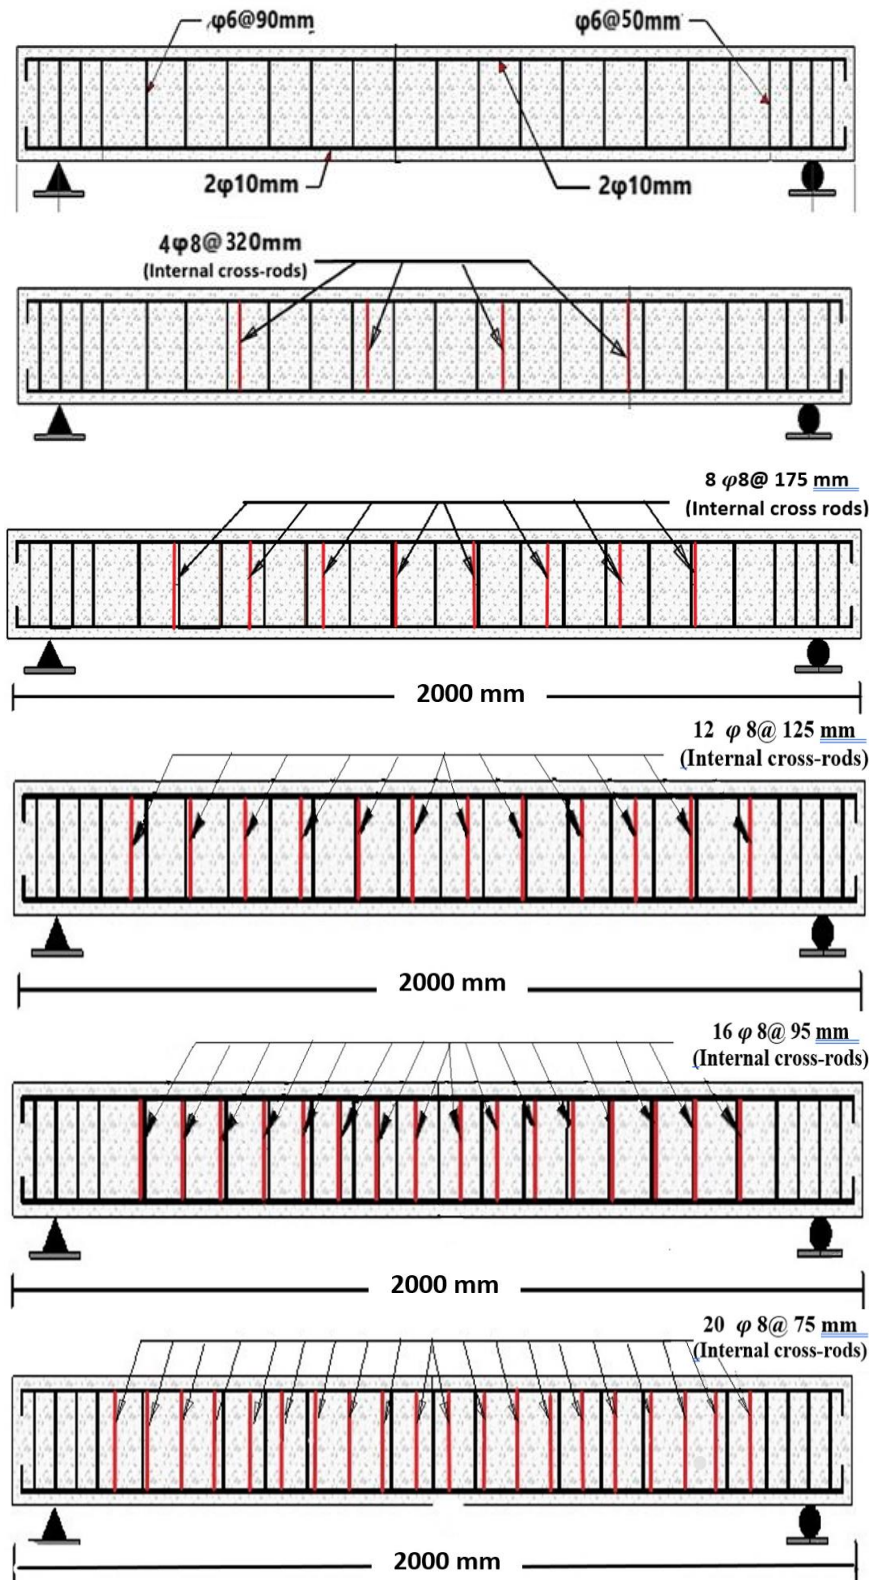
Reinforcement and distribution of internally cross-rod for concrete beams in each of the three concrete groups
